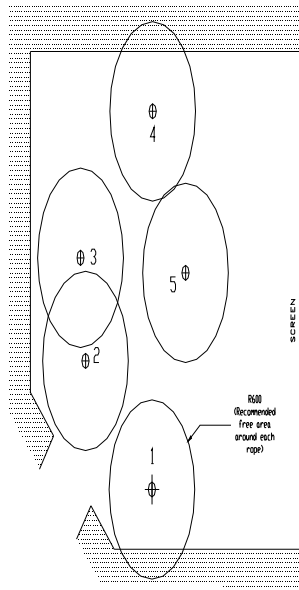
GROUND FLOOR Existing rope circle transposed to ground floor
